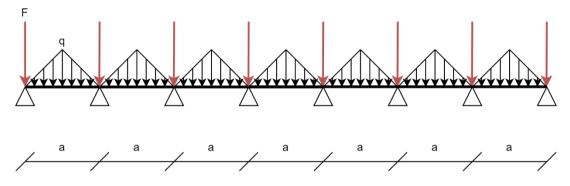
Schematisation of the load on 7 beams. The supports represent the piles on which the beams are placed.
